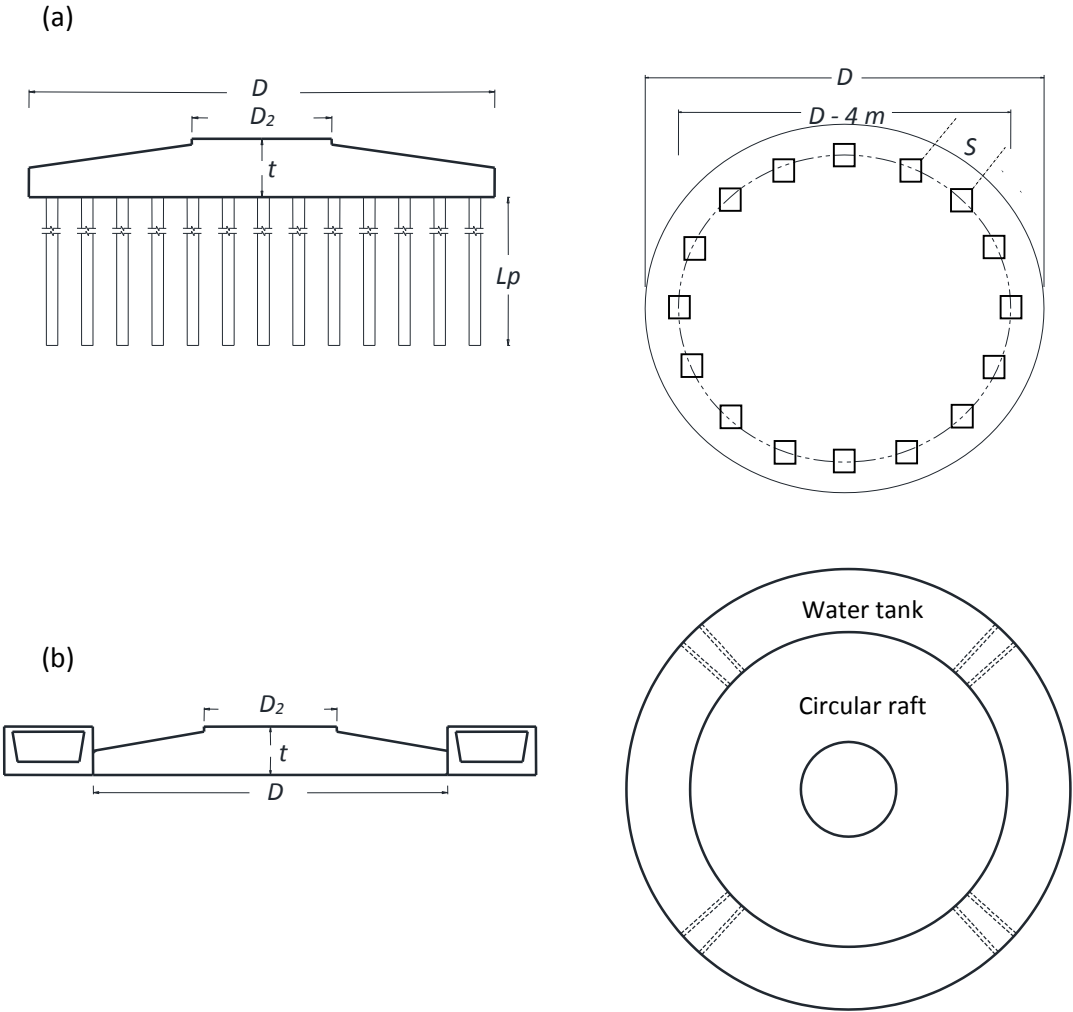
(a) Piled raft, and (b) Circular raft surrounded by a water tank.
